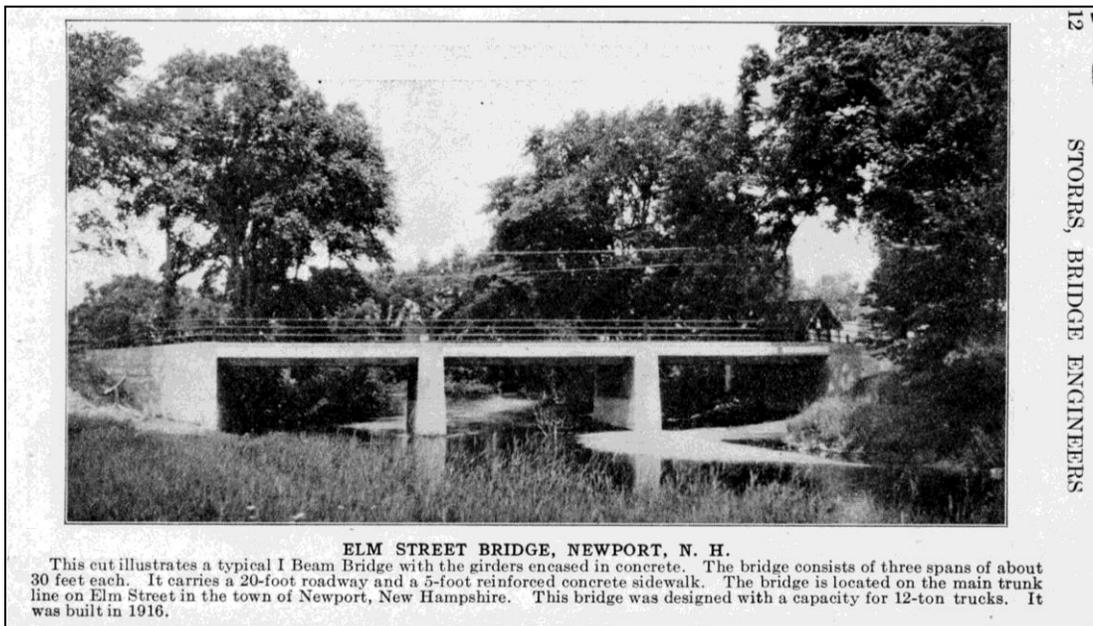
Newport 137/100, Elm Street Bridge (1916). An early consulting job for Storrs was repairing the covered bridge at this location for the Town of Newport in 1906. Ten years later he was called back to replace the covered bridge with the 3-span concrete bridge above (Storrs & Storrs, 1918, p. 12).
